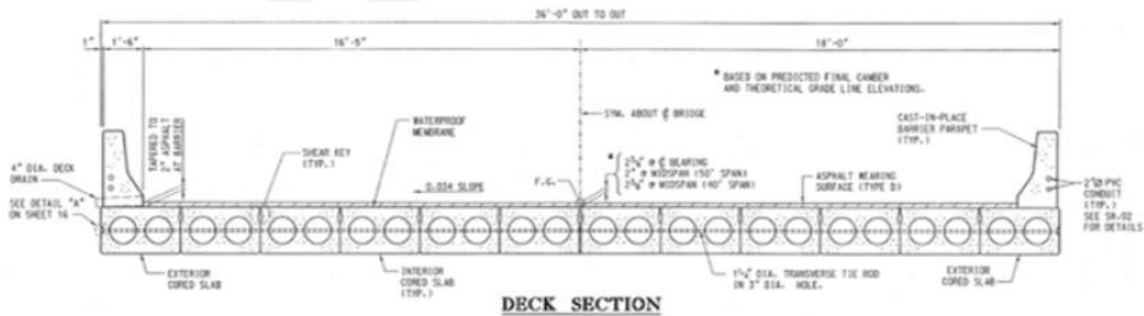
Cross Section of Suck Creek Bridge (Sheng et al., 2013)
